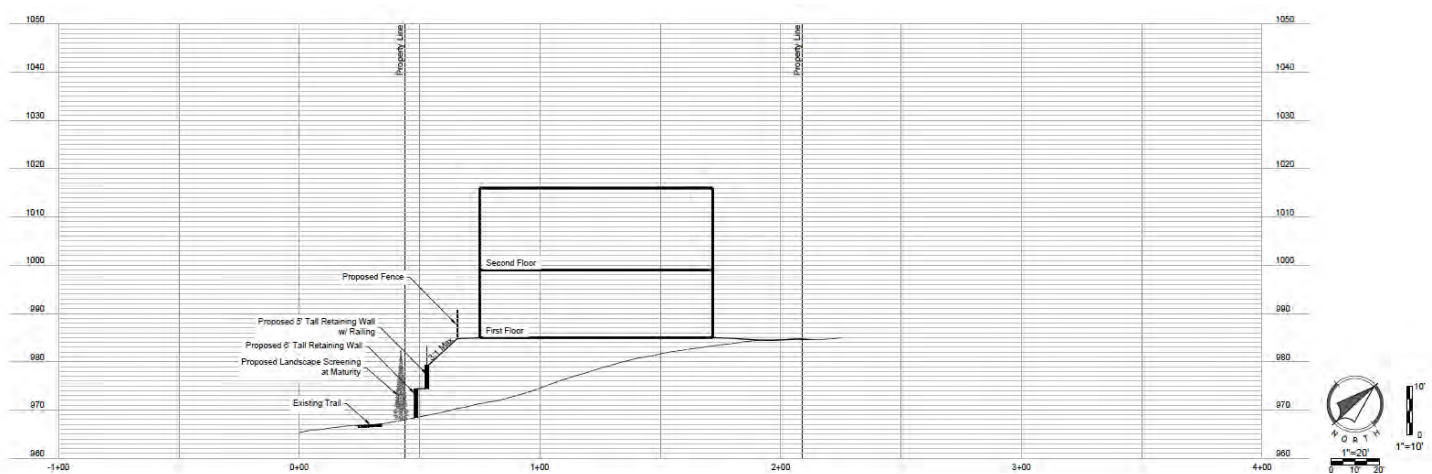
Cross Section of Subject Site and Adjacent Trail
